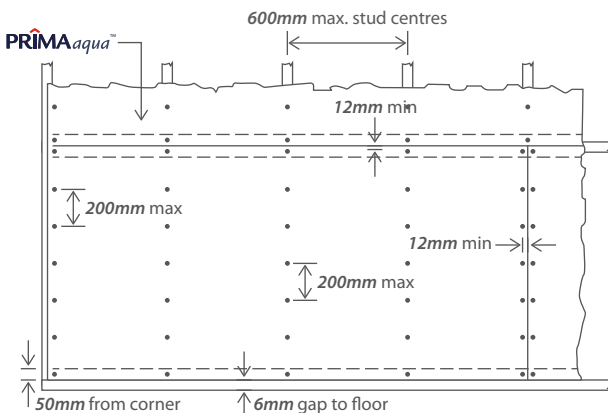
Horizontal Sheet Fixing (Untiled Wall)
